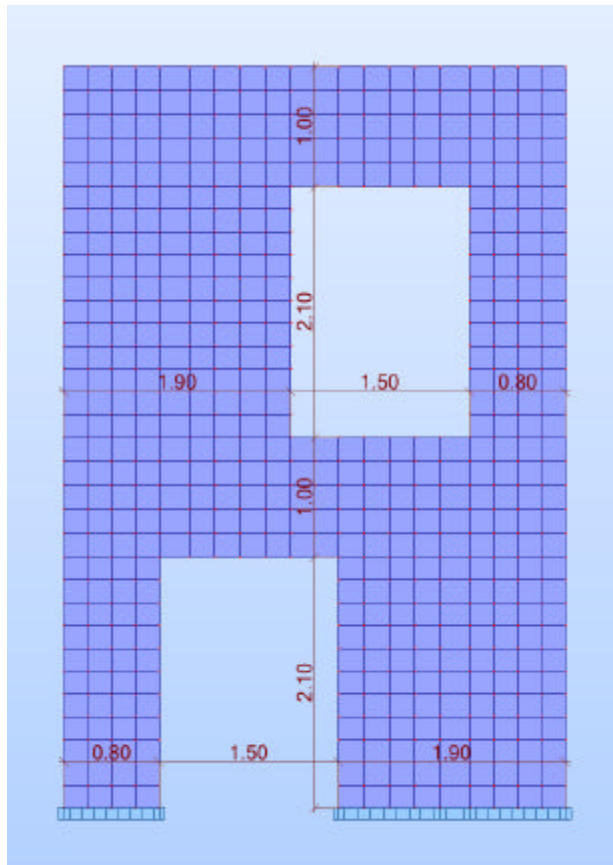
Shear wall geometry and meshing (dimensions are in m). Wall thickness is 0.15 m.
